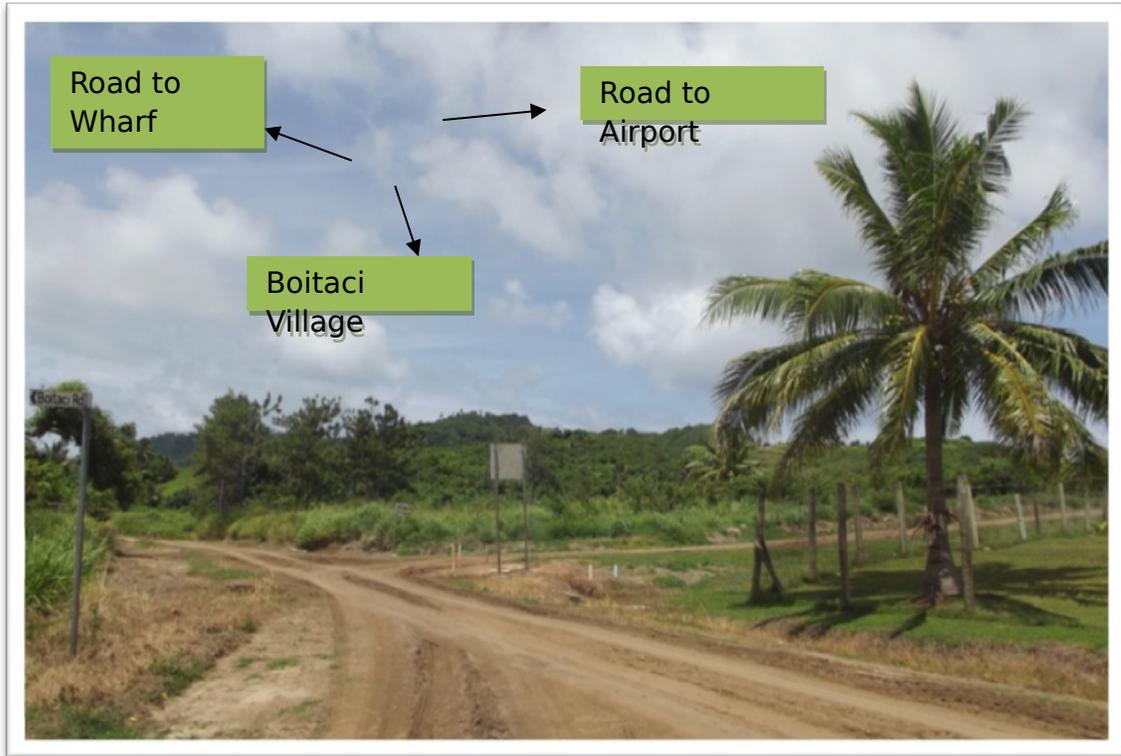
Proposed site at the junction of Boitaci and Malaka Village.
